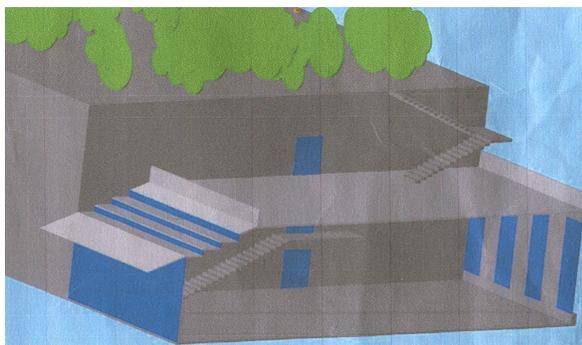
The Physics building, retrofitting interventions: new transition space and roof planting
